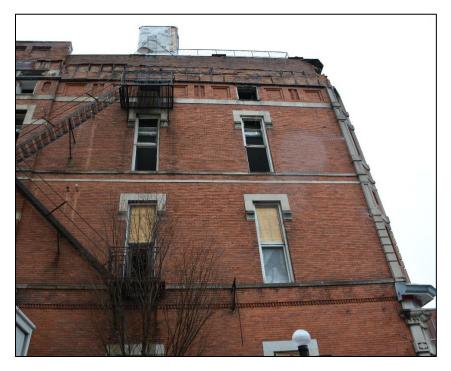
The railing and one of the stair towers can be seen on the Church Street side. Evidence of a missing cornice can be seen at the top of the building.
